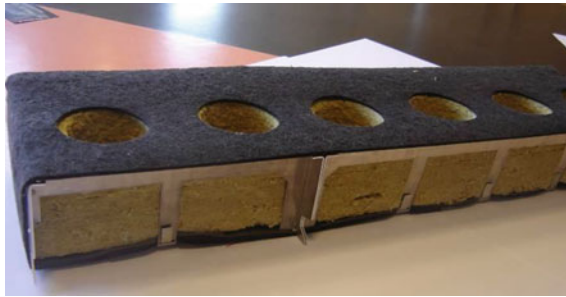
Cross section of a living wall system based on mineral wool. Thicker rooting medium resulting in more redundancy against dehydration. Irrigation and nutrient system necessary
